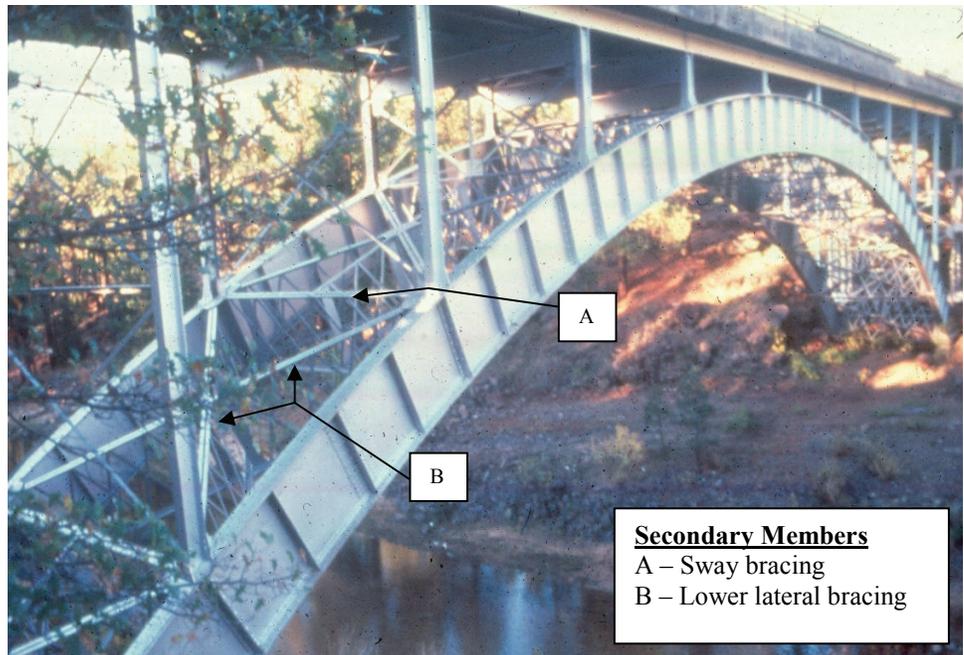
Solid Ribbed Deck Arch Secondary Members
